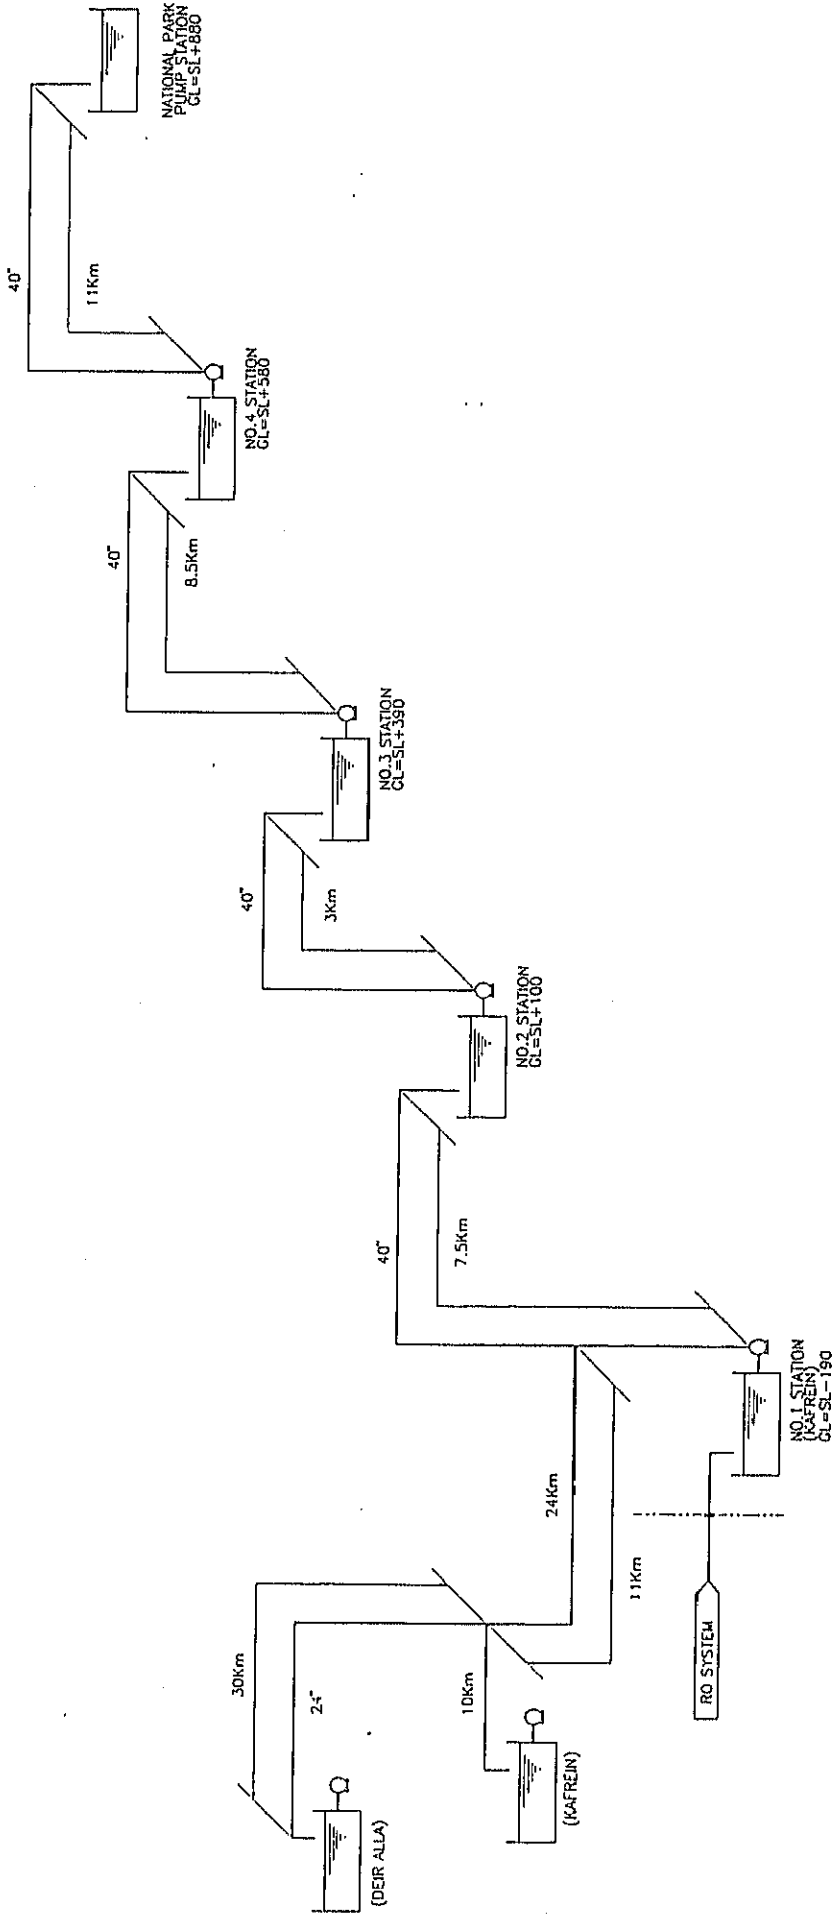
15 Layout of Desalination Plant (Plan C)
